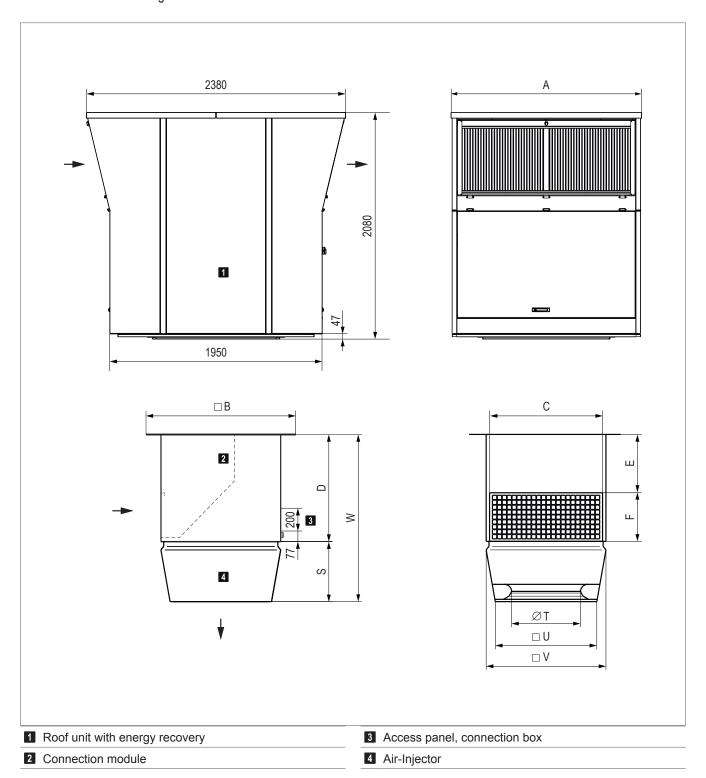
Dimensional drawing for RoofVent® R (dimensions in mm)
